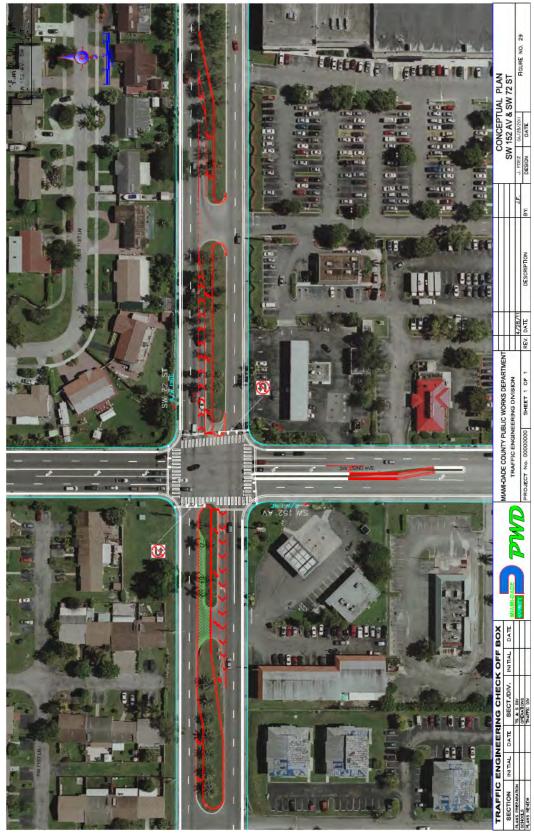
Conceptual Plan – SW 152 Avenue and SW 72 Street
